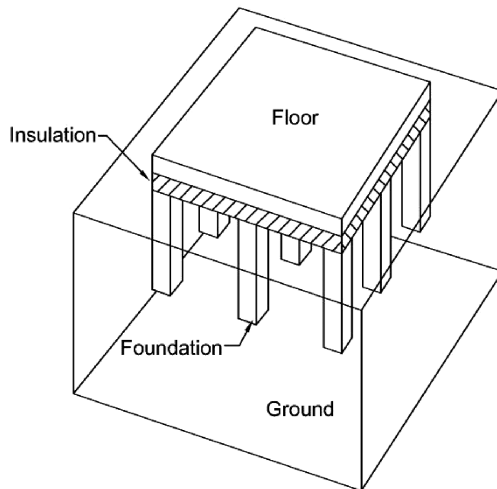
Three-dimensional numerical model for a building slab-on-grade foundation with thermal piles.
